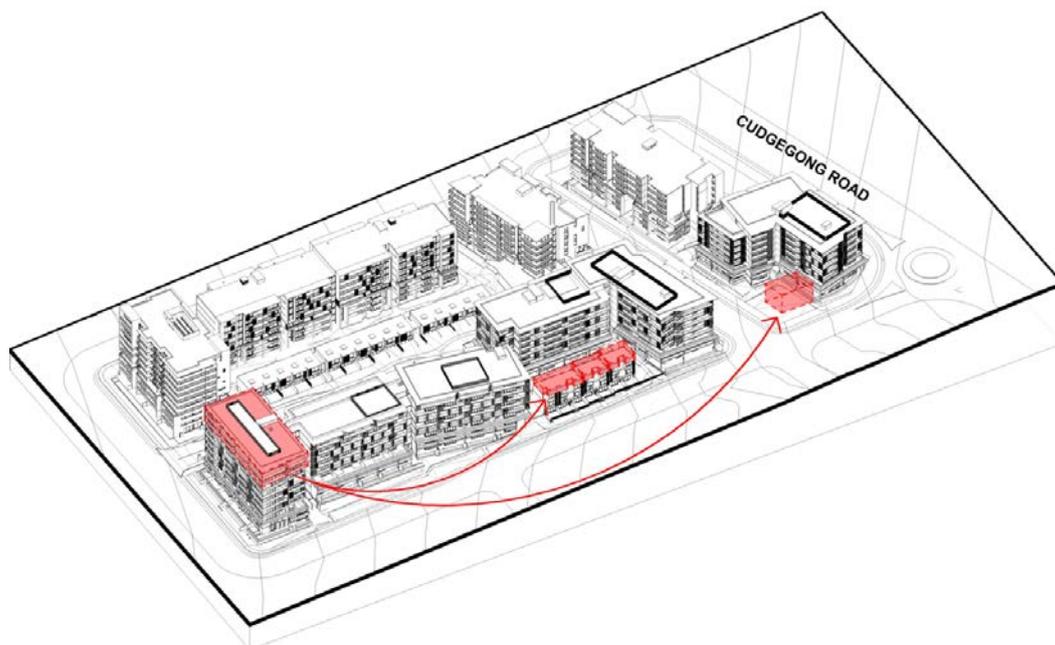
Massing model for 56 Cudgegong Road (the northern site) of the proposed development, demonstrating that the 2 additional storeys (consisting of 10 apartments) to the Building E (left of the image) have been redistributed/reallocated from the centrally located 3 storey Building B2 elements and the communal open space area of Building A (right of the image).
